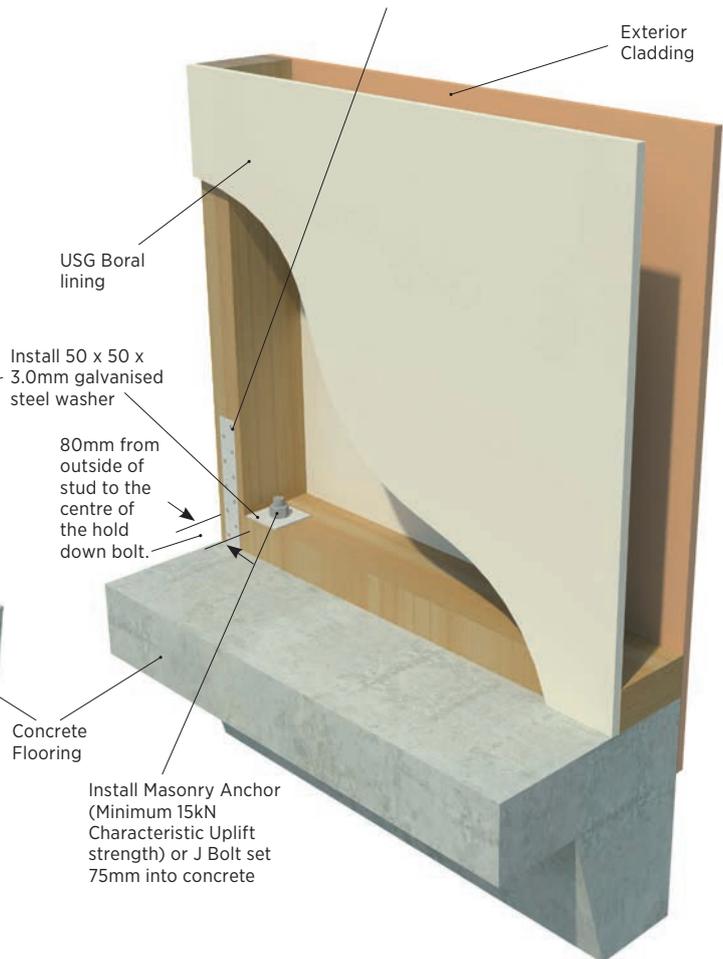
EXTERNAL WALL ON CONCRETE FLOOR
